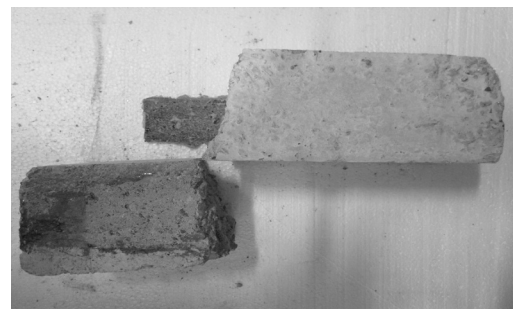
Failure surface of concrete beam strengthened with CFRP fabric in $+50^{\circ}\text{C}$
